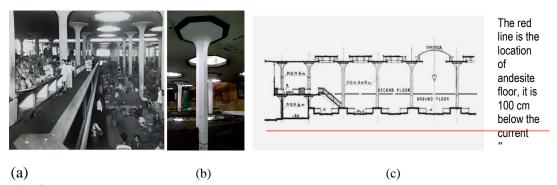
Totally the high dimension of column is 800 cm. The first floor becomes 250 cm height because the ground floor position is always raised to avoid tidal flooding a) The column of Johar market's mushroom; b) Johar market column height should be 800 cm. c) section plan of Johar market, . *Source:* Co, 1938 and Detail Image of PT. Yodya Karya
